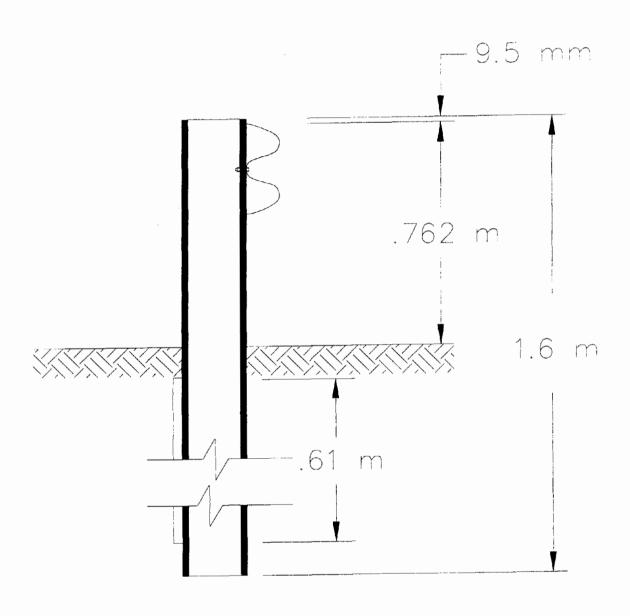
Cross-section of W-beam, weak-post (G2) guardrail system.
